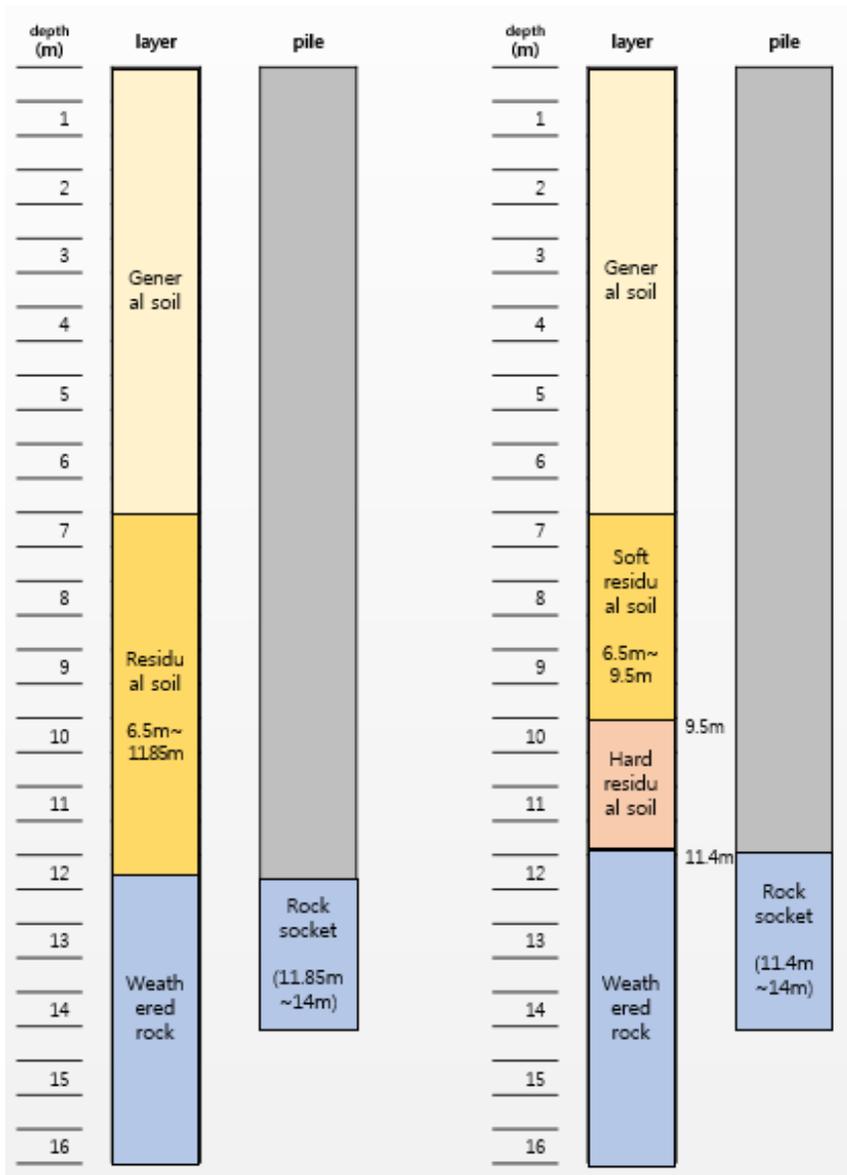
Section view of the subsurface layer for pile No. 3 before and after Modification
